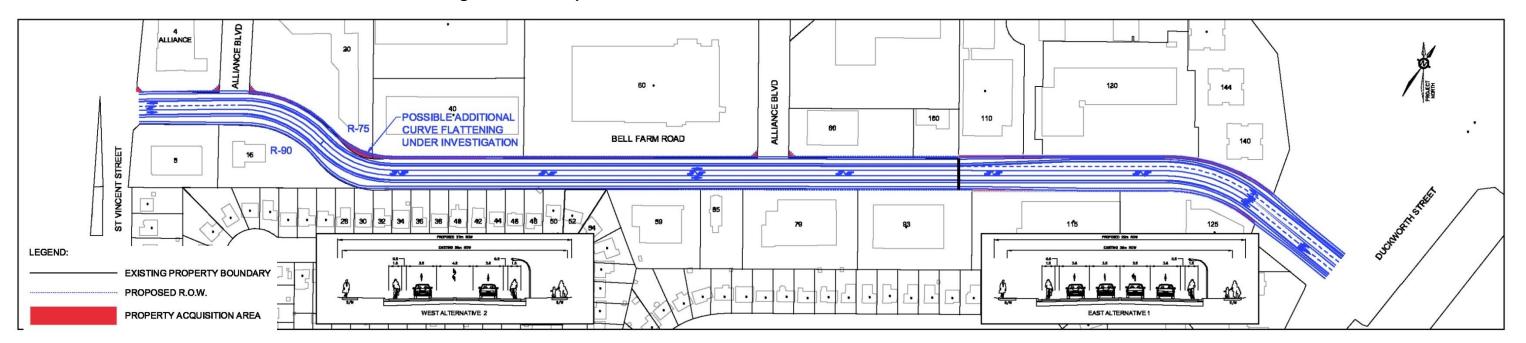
Concept Plan - Bell Farm Road Alternative 2: Improved Geometrics
